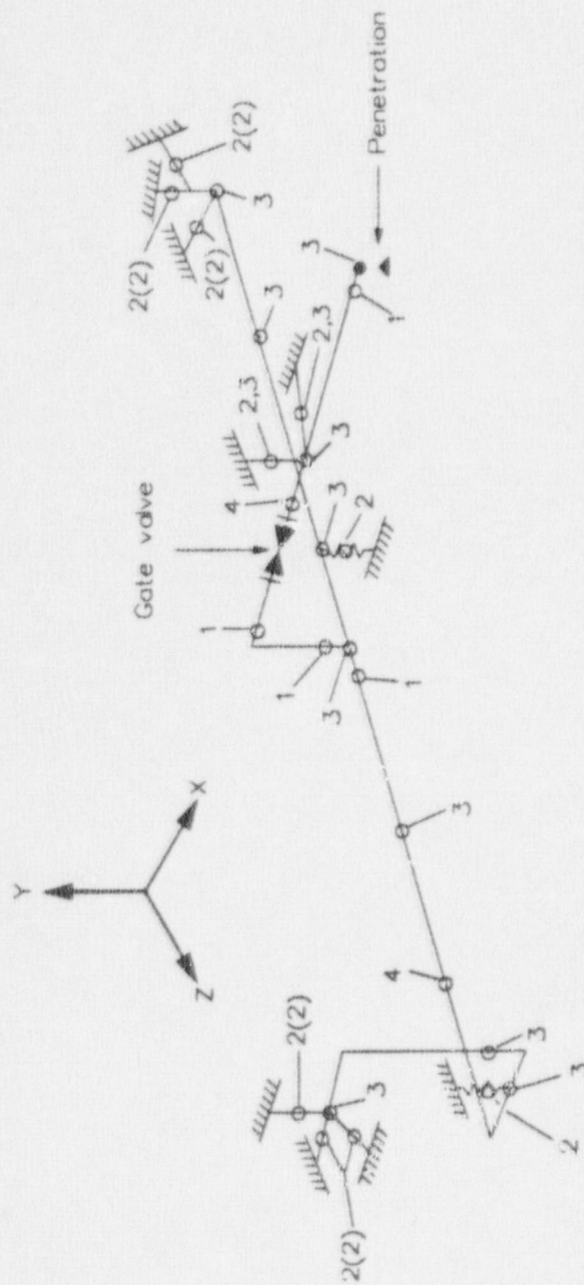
Sketch showing the location of the 8-in. piping system with gate valve installed in the test fixture.
